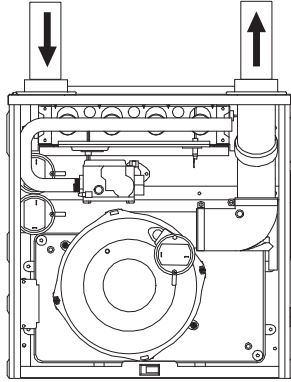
Direct Vent Air Intake Connection and Vent Connection
